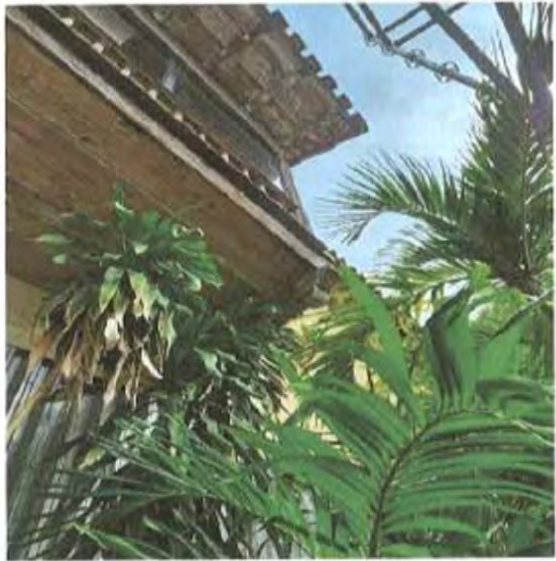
West Balcony looking at underside of balcony floor with end outrigger for support of roof post above
